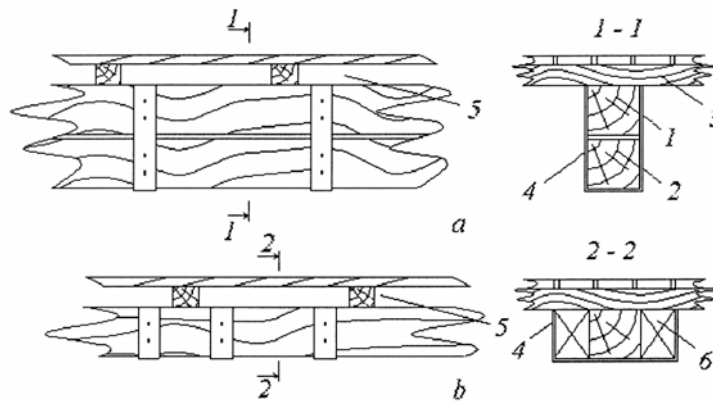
Beam strengthening using wood elements [12]: 1 – existing beam, 2 – new beam, 3 – secondary beam, 4 – metallic anchorage, 5 – air, 6 – lateral beams.
